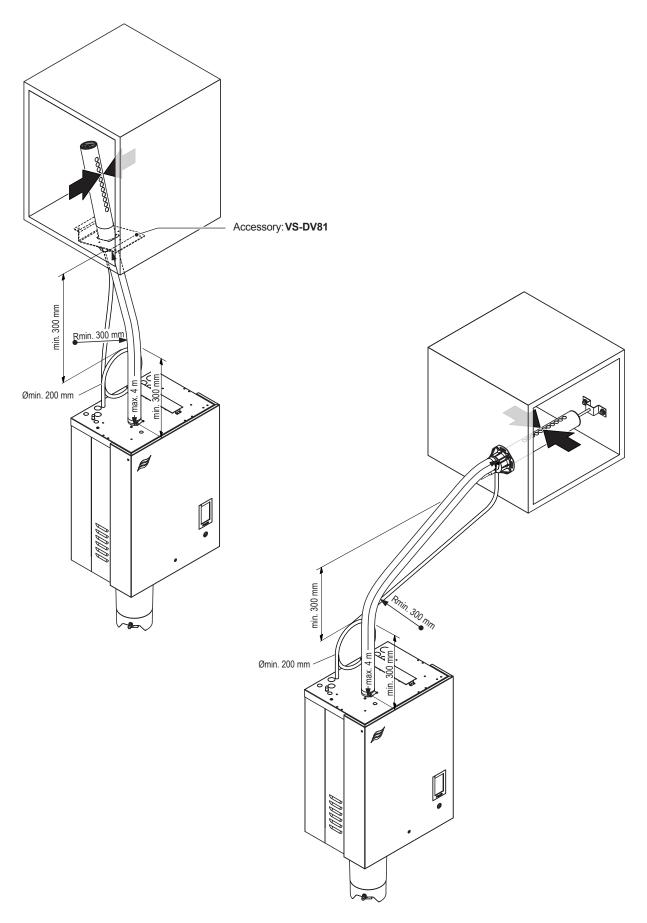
Steam distributor mounted more than 500 mm above the top edge of the humidifier
